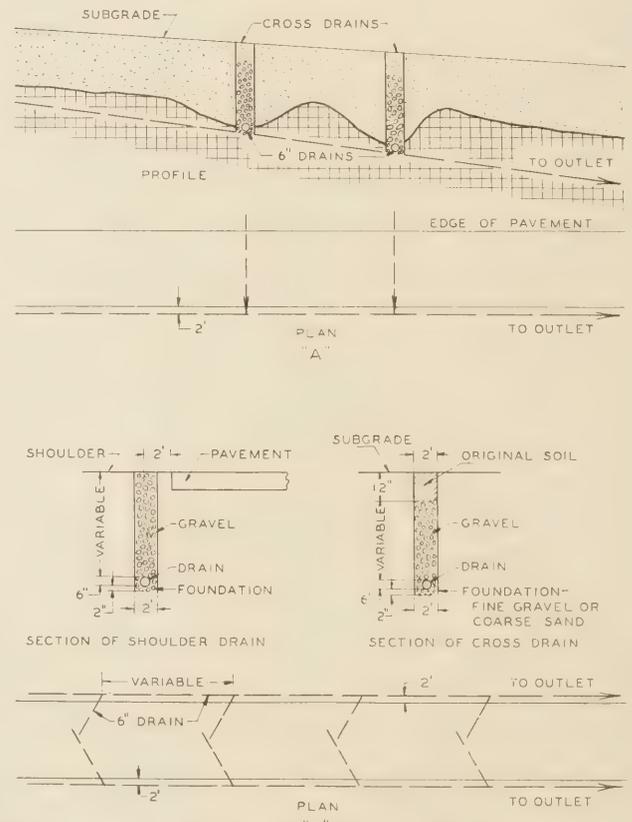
METHOD OF PREVENTING FROST HEAVE IN DRAINABLE SOILS.
